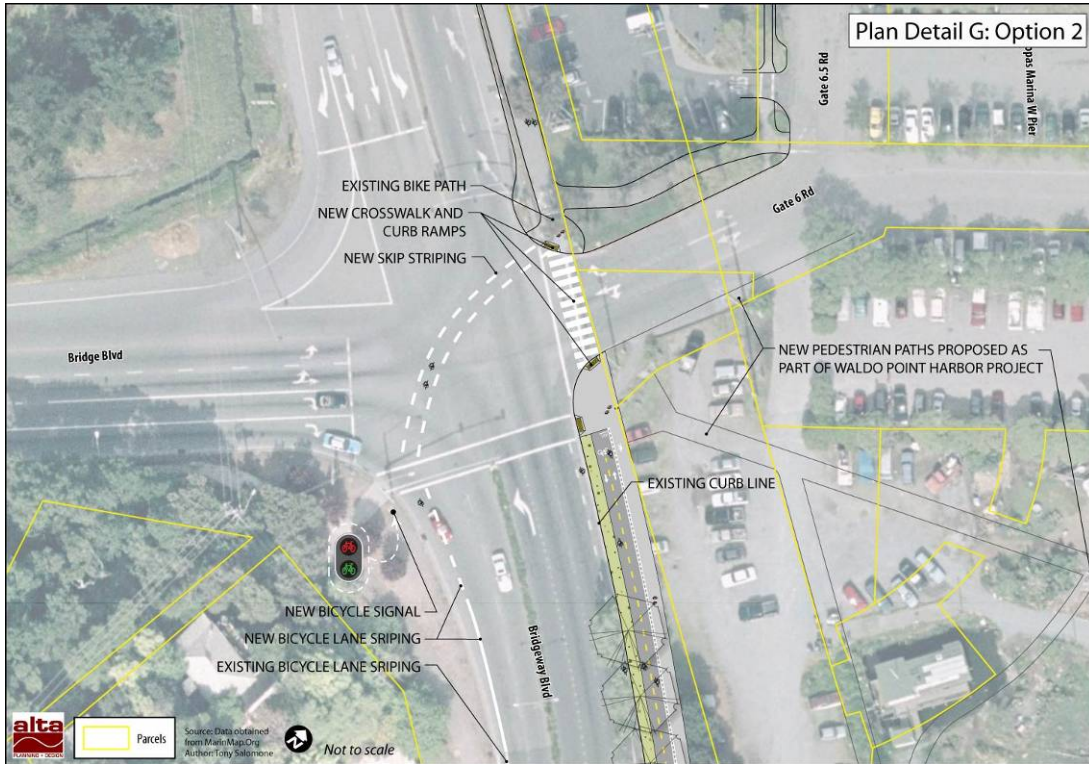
Gate 6 Road Intersection Improvement Option B Bike Signal
